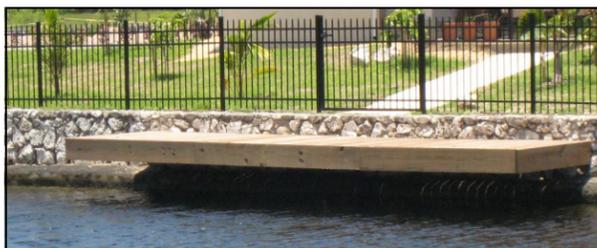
The above dock is cantilevered on the canal wall and therefore does not require pilings. A similar technique should be used for swim and fish cleaning platforms on ocean front docks.
